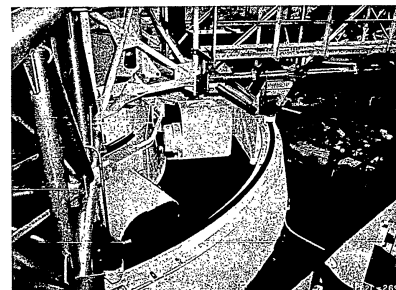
Completed tower roof, showing motors and brakes, survival roll and locks, as well as auxiliary air-driven lubrication pump. Tower and equipment were painted white to minimize the effects of heating due to the sun.
